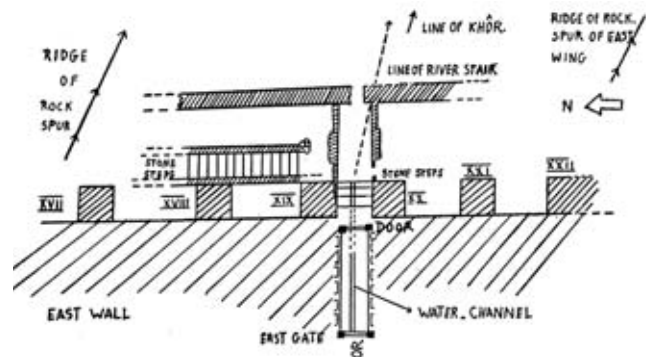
Mirgissa, Southeast Gate/River Gate, sketch plan (after WHEELER 1961: 136, fig. 57)
